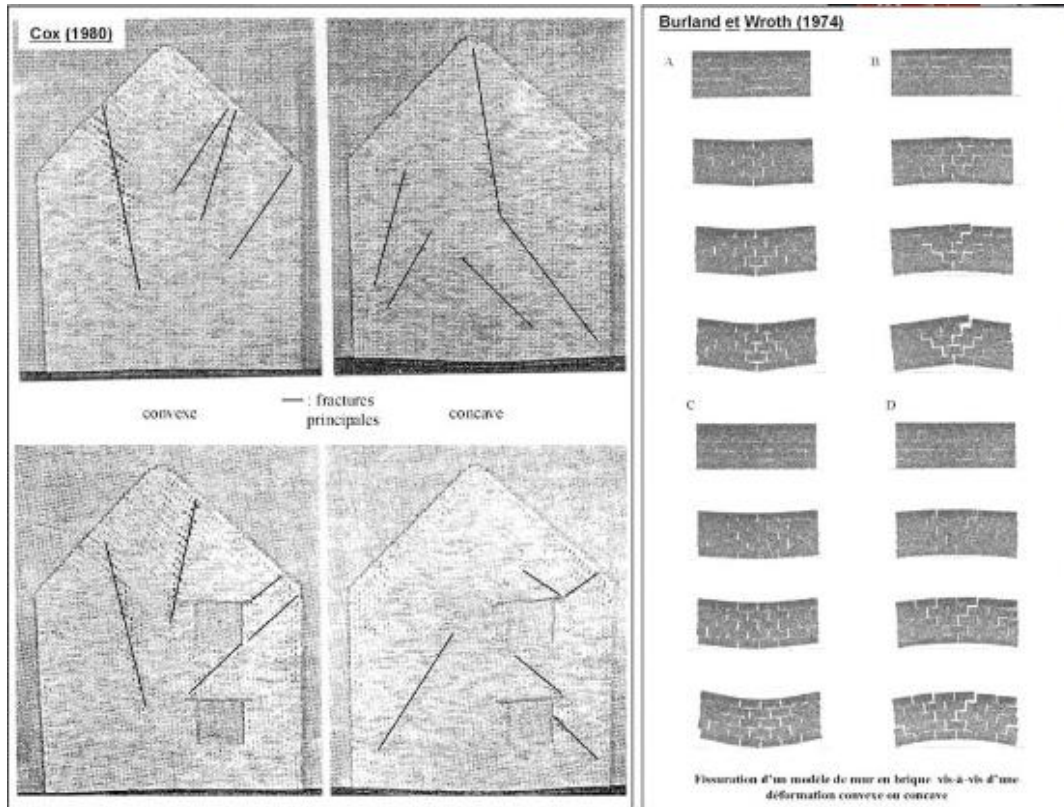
Experiments highlighting the behavior of a masonry structure and the orientation of cracking - Deck (2002)
